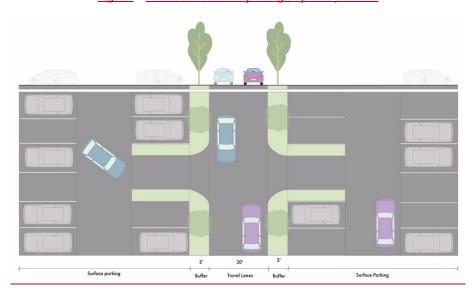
Mixed-use/multifamily parking lots on secondary streets.
